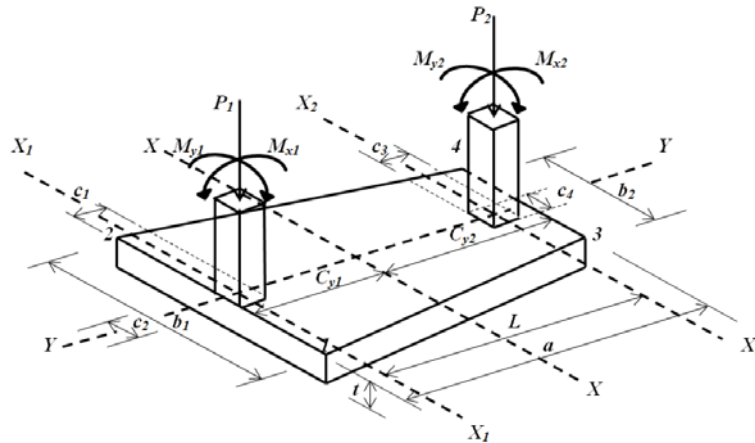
Boundary trapezoidal combined footing subjected to the real loads
